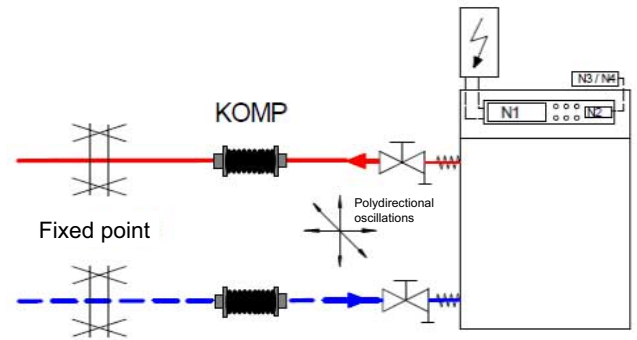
Attachment to the heat pump is achieved using fixed points.
